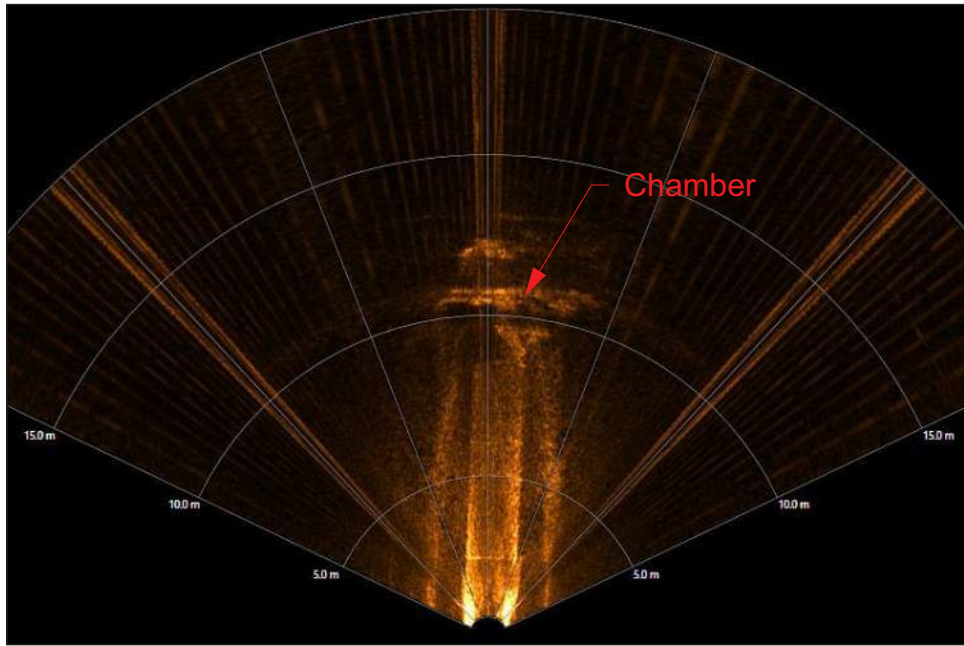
A-7: Sonar image at 165 feet downstream of Manhole 1. Manhole 3 chamber 35 feet ahead.
